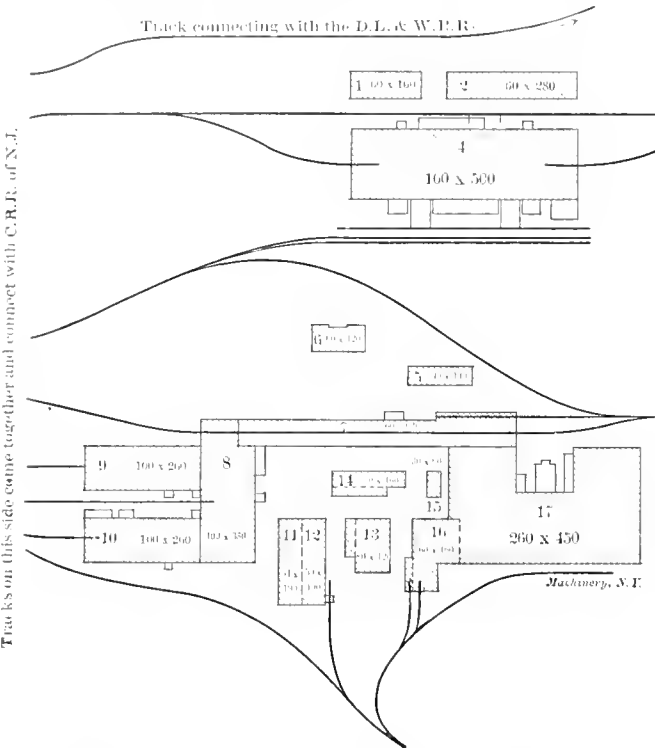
Plan of New Works of Ingersoll-Sergeant Drill Co.
